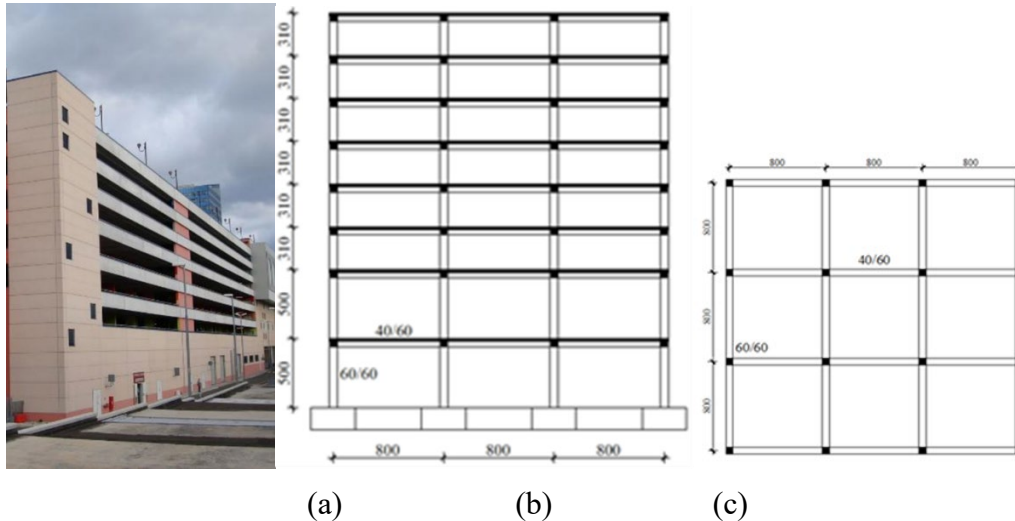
(a) Building of garage of the Tower Centre, Rijeka, Croatia; (b) Cross-section; (c) Plan of one segment of the garage structure
